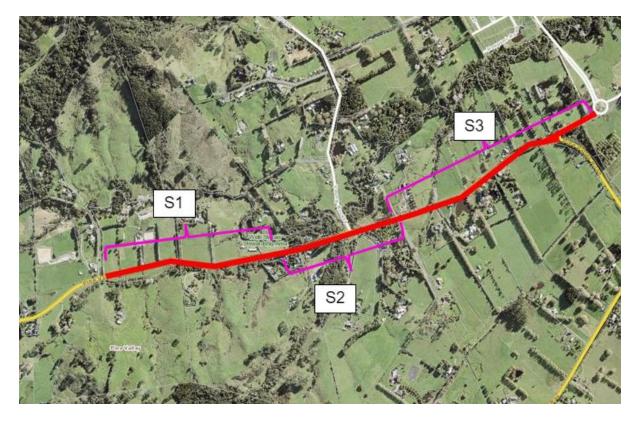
Recommendation for widening – Upgrade to Pine Valley Road
